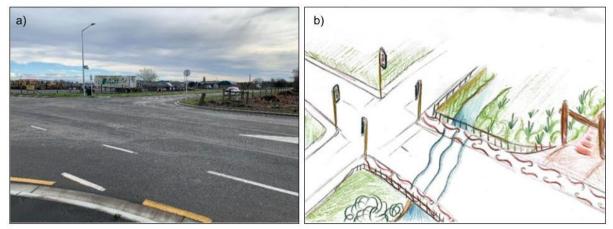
a) Photo of Site One, Belfast Road. b) Drawing of proposed solution for Site One.
